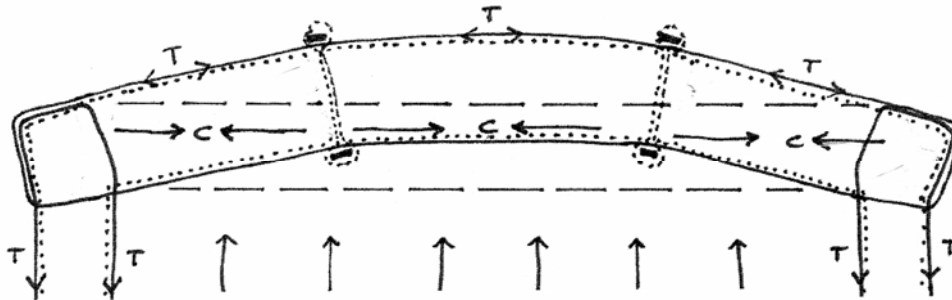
Plan of an adobe wall reinforced with car tyre straps subject to out-of-plane loading away from internal return walls. Tension forces in the straps (solid lines) and compression forces within the adobe are illustrated. The small dotted lines outline the adobe walls and the horizontal tie wires.
